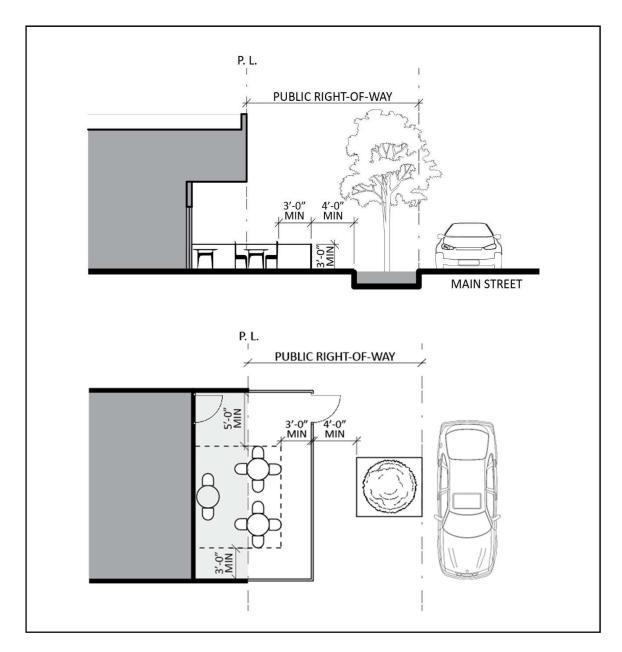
Example of a dining alcove in conjunction with an outdoor dining area in the public right-of-way with a barrier.
